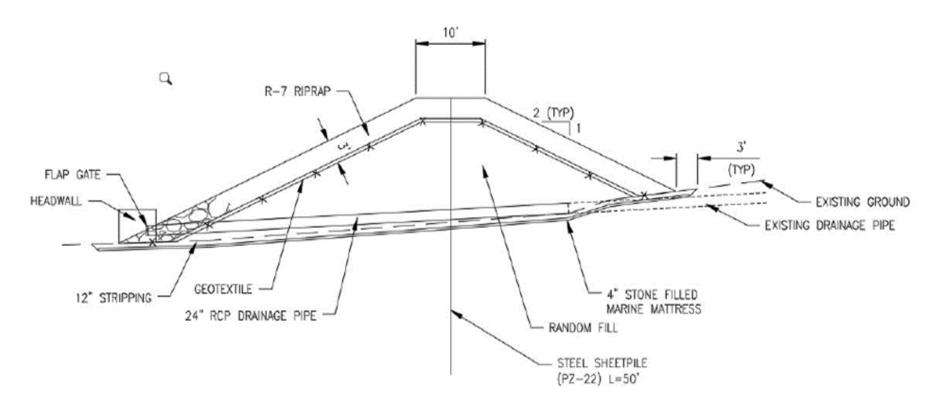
Typical Section of Levee "Type A" Perimeter (Perimeter Plans)
